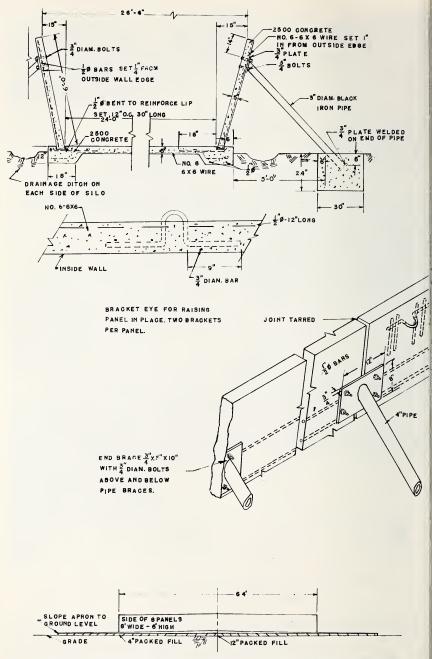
Details of construction of a tilt-up concrete wall silo.
